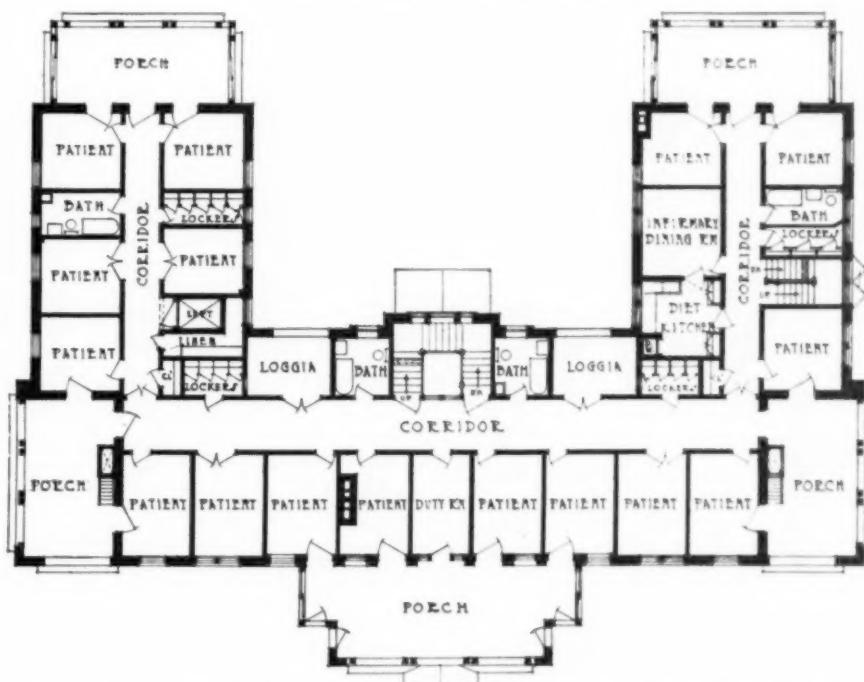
Nopening Hospital for Tuberculosis. Administration building. Second floor plan.
